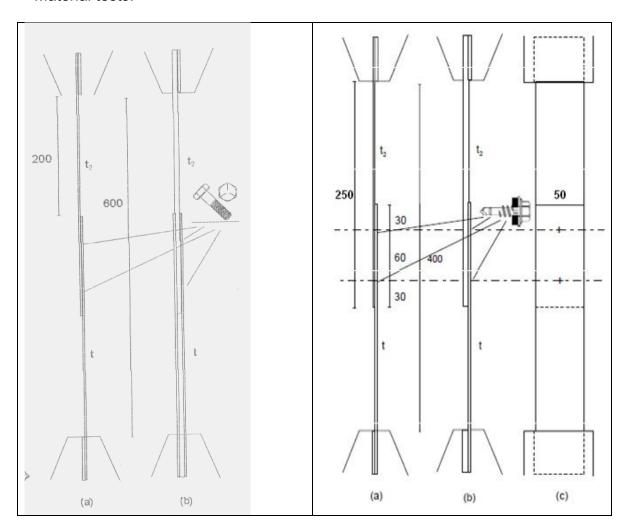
Dimensions of samples for bolted (left) and screwed (right) connections of single (a) and double (b) shear tests.
